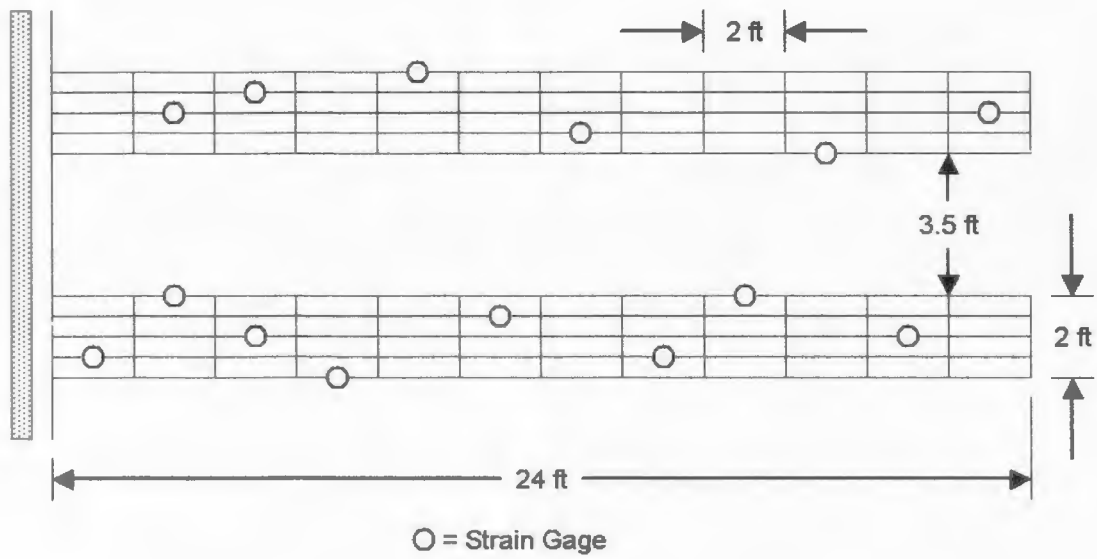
Plan view of instrumented primary bar mats at base of wall
